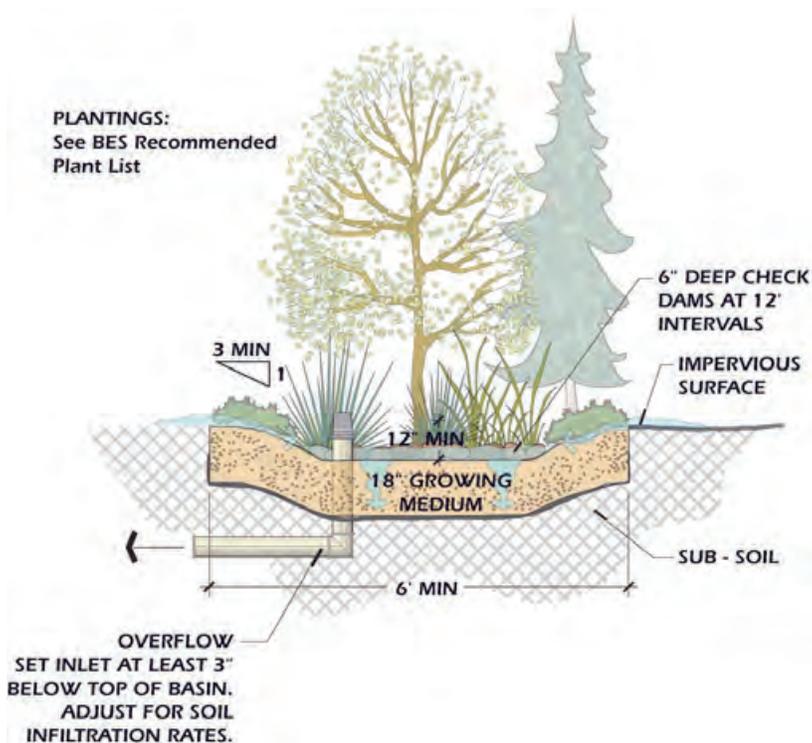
TYPICAL SOFT LANDSCAPE BIOSWALE CROSS SECTION WITH OVERFLOW INLET
